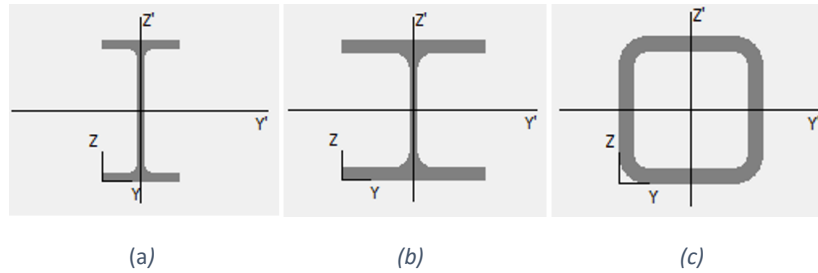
Cross-sections of elements with: (a) IPE, (b) HEA and (c) SHS
